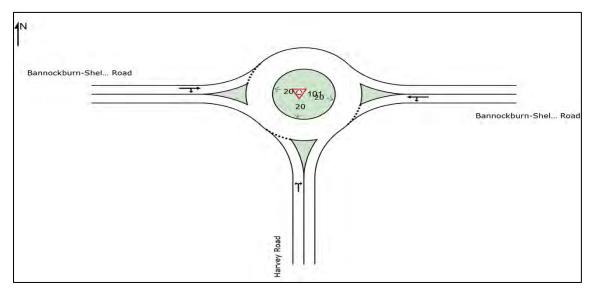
Harvey Road / Bannockburn-Shelford Road SIDRA interim intersection layout
